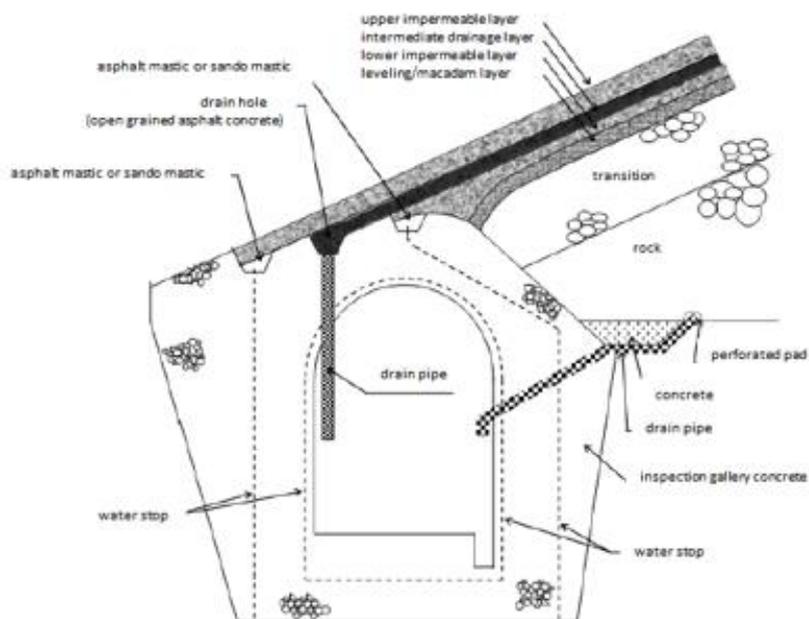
Alternative Gallery – Asphalt Face Connection Detail
